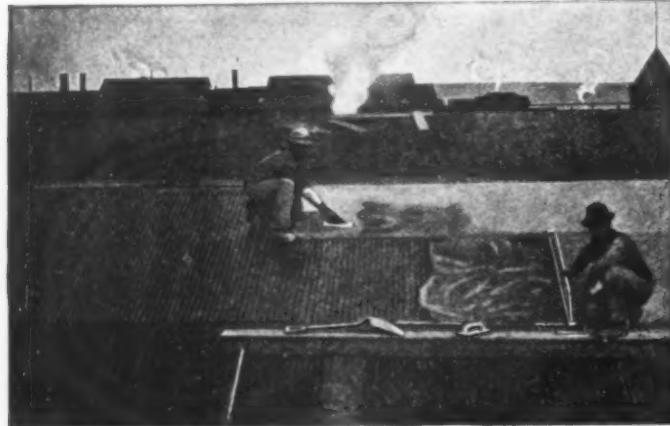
CEMENTING A FERROINCLAVE ROOF.
